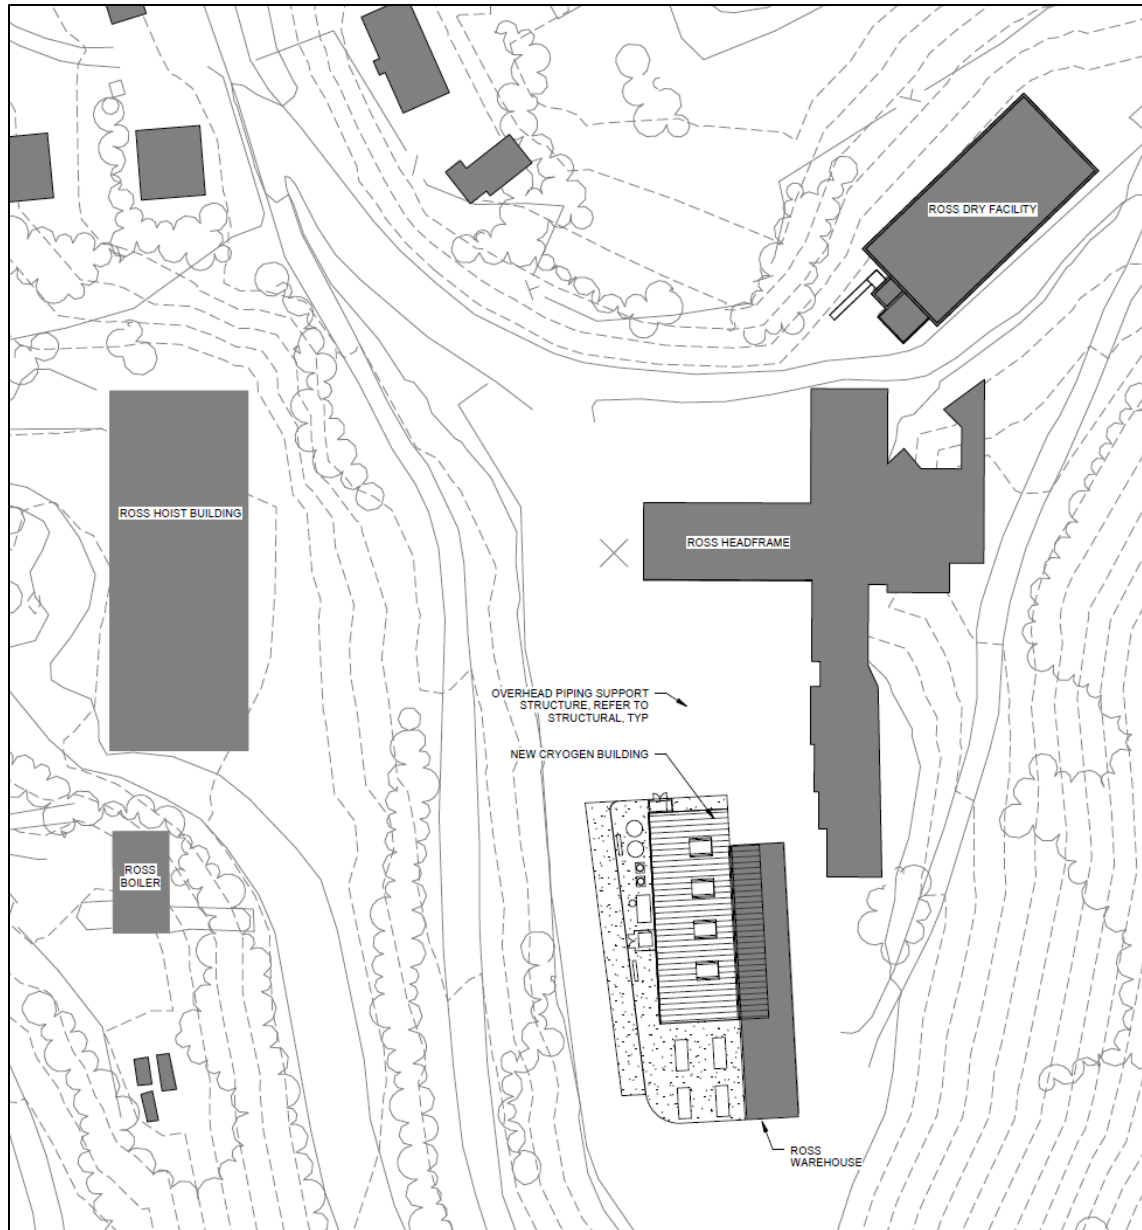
Ross Complex Architectural Site Plan (Arup)
